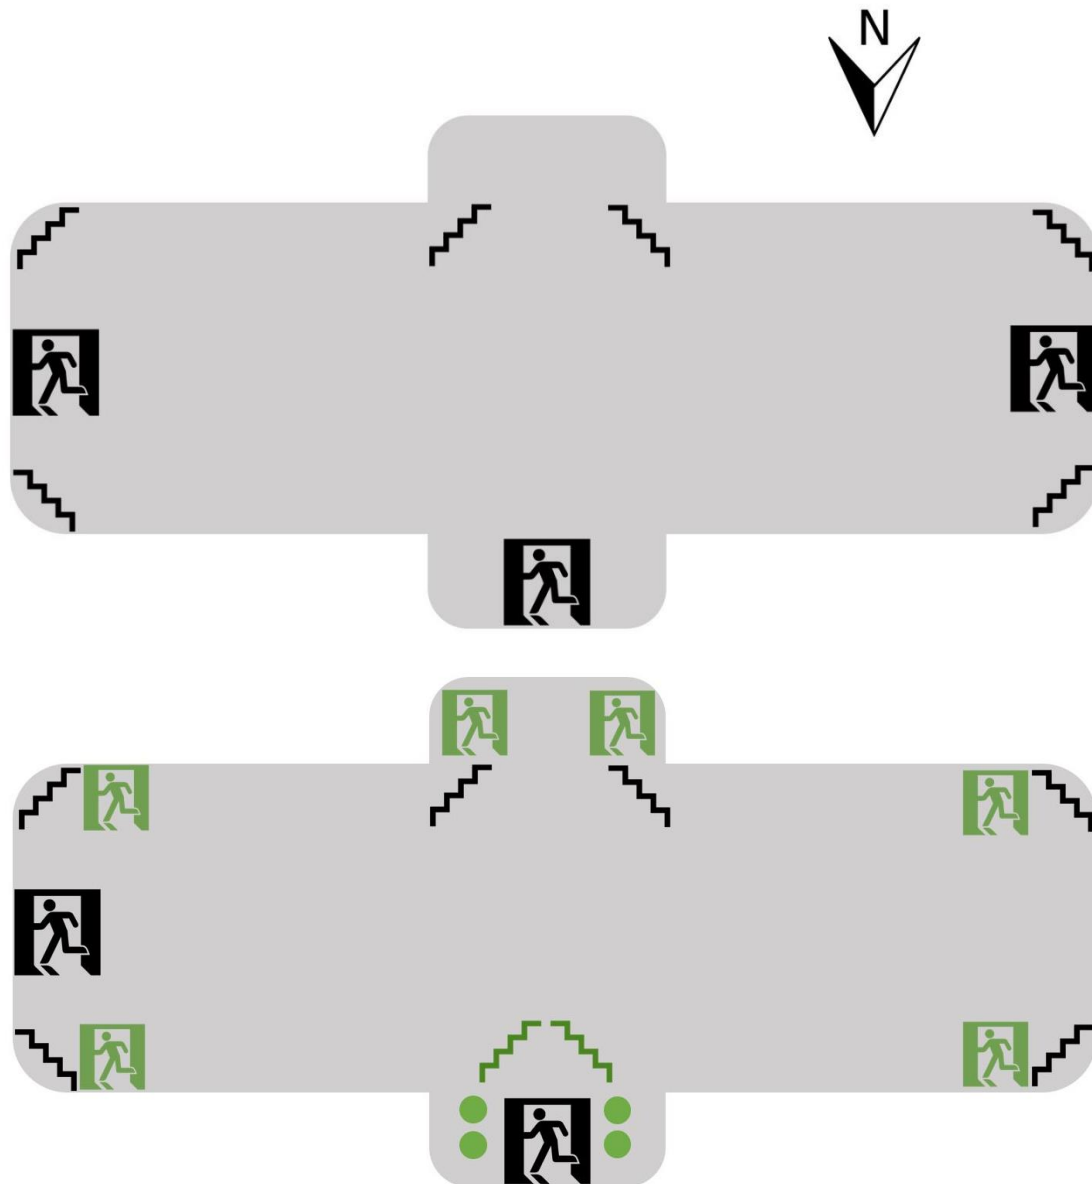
Simplified museum floorplan showing the historic exit and stair locations in black (top), and current layout with additional elements (stairs, exits, and columns) in green (bottom). Three new exits in back corners simplified to one exit on each side in diagram (seen at the top of the diagram).
